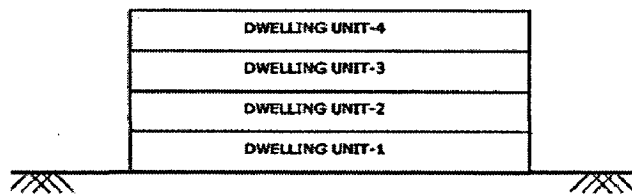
Multistoreyed row house with different dwelling units on each floor
